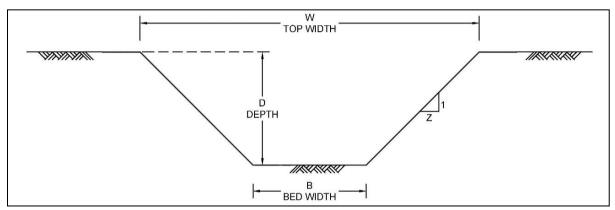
Typical Cross-Section for an Earth Channel (Source: Consultant, 2022)
